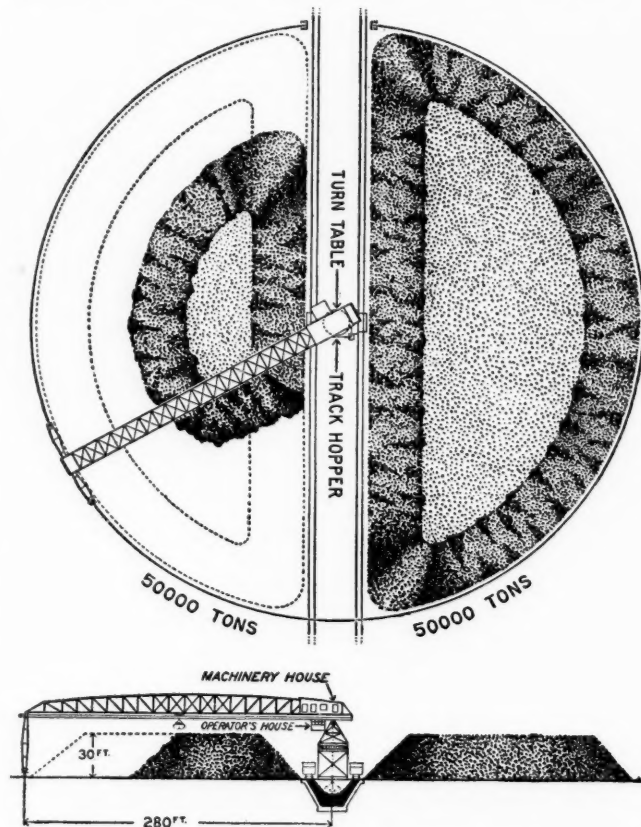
DIAGRAM OF SWINGING BRIDGE COAL STORAGE
